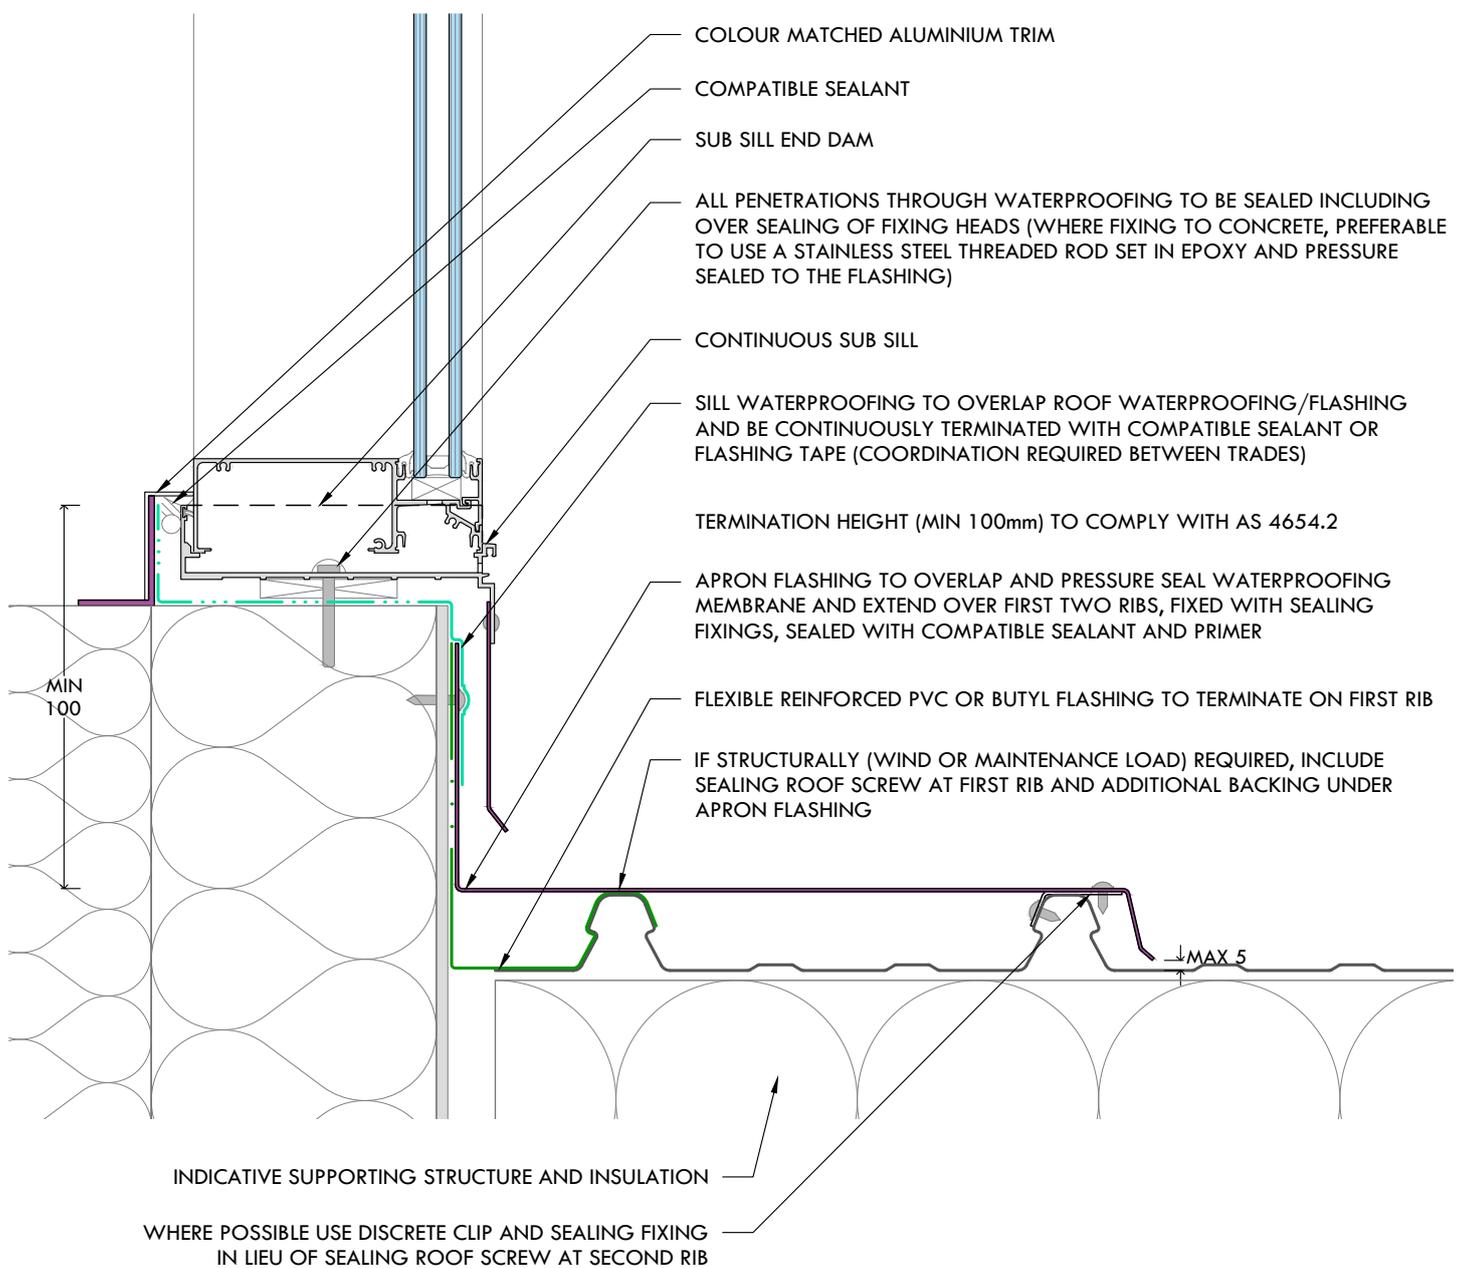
METAL ROOF TERMINATION AT WINDOW SILL
